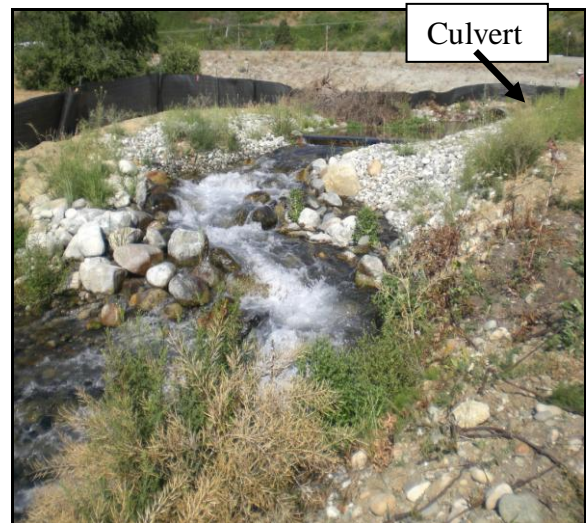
Looking upstream at the downstream end of the Beebe Creek culvert
